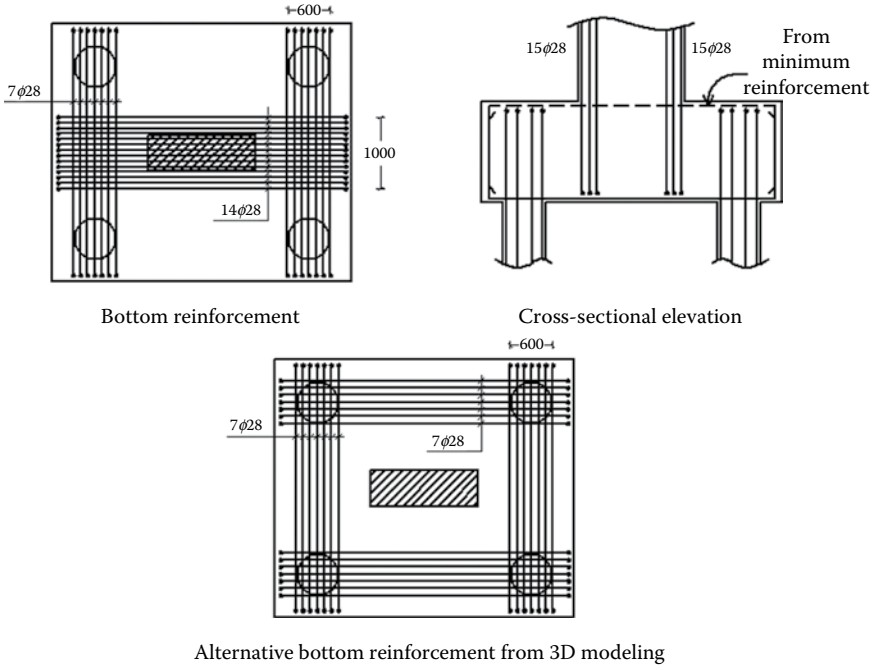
Example 8.1—final reinforcement layout from *STMs*.
